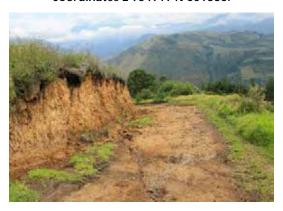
KP0+000. Point of origin of the access road to El Porvenir farm.
